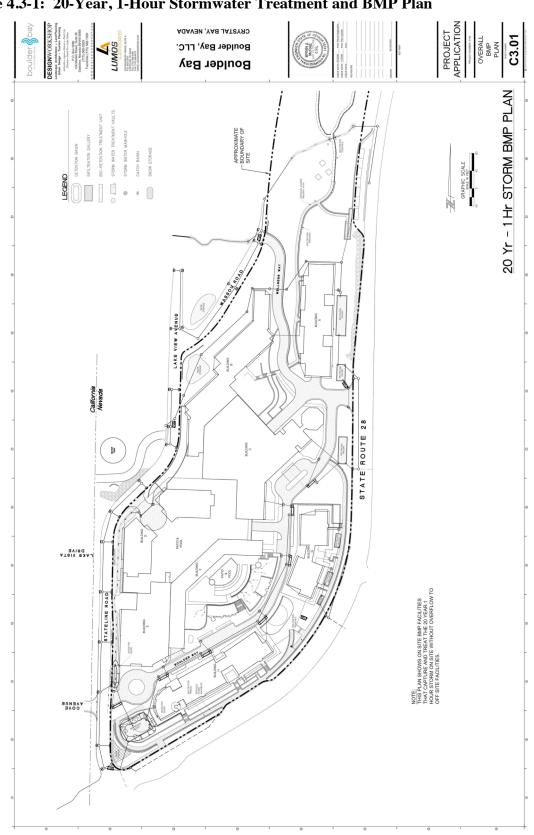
20-Year, 1-Hour Stormwater Treatment and BMP Plan
